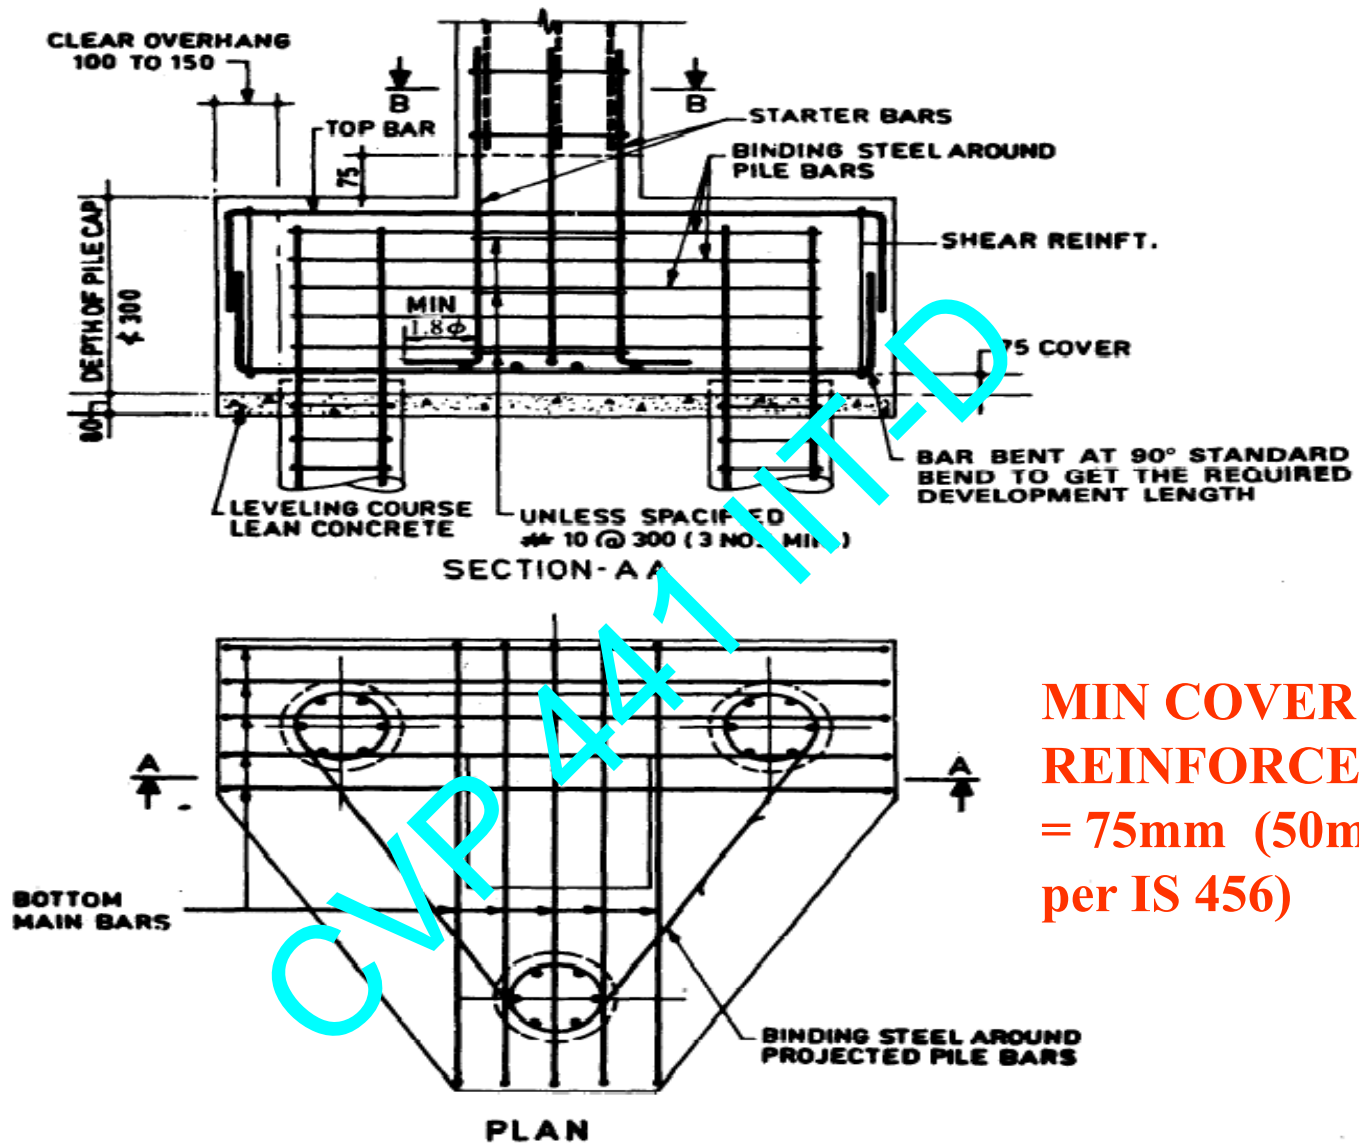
GENERALLY ADOPTED CONFIGURATION FOR PILE CAPS (ALONG WITH PLAN ARRANGEMENT OF REINFORCEMENT)
